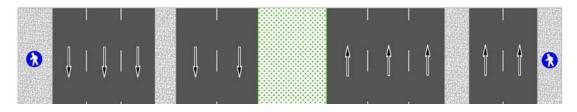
A: Morrissey Boulevard Existing Cross Section
